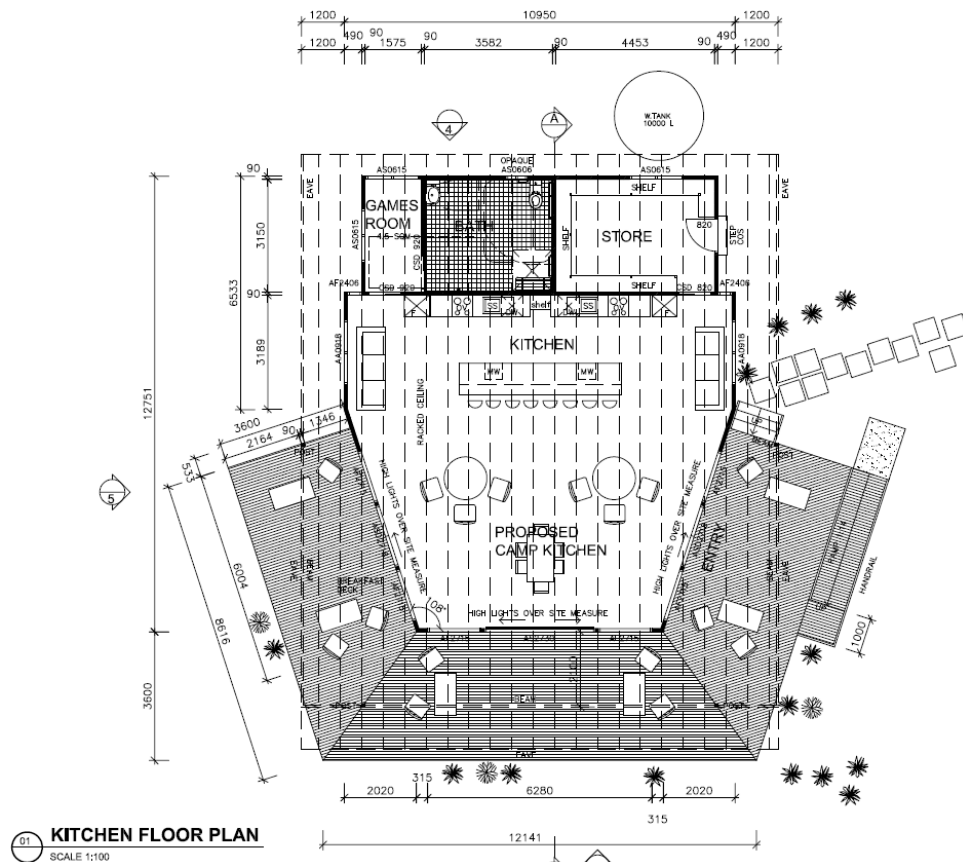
Extract of the Floor Plan for the Camp Kitchen
